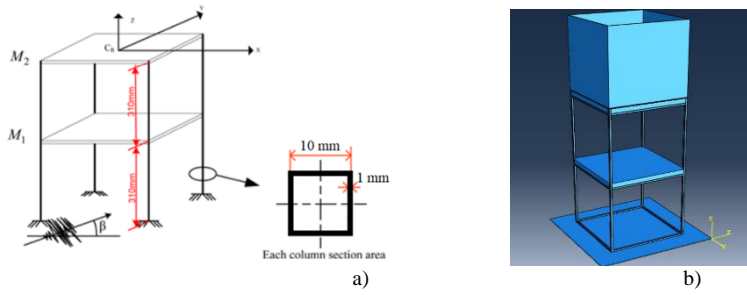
Structural models: a) Schematic of 2DOF shear frame system, and b) 2-story-floor CAD simulation
